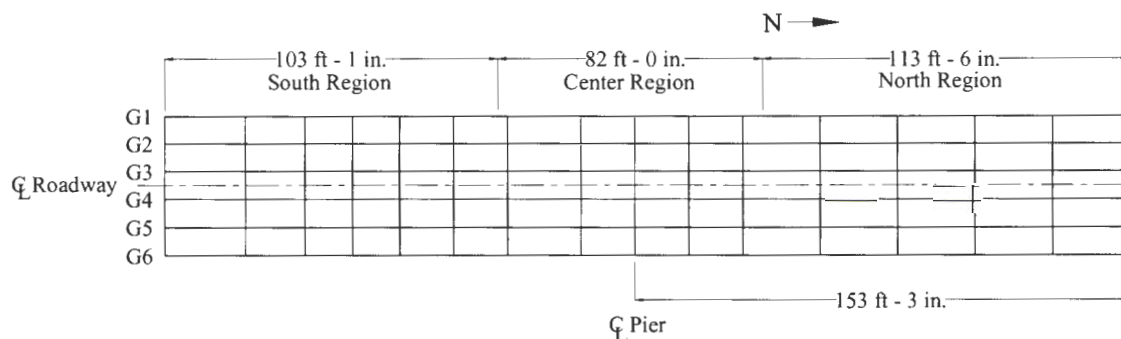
Plan view of the E. 12th St. Bridge framing system.
